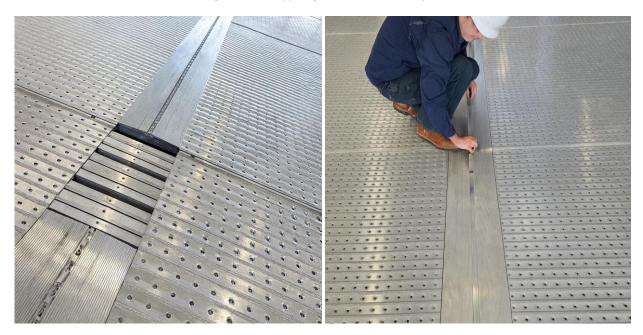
Trench cover lids partially installed with some support girders still exposed (Left).
